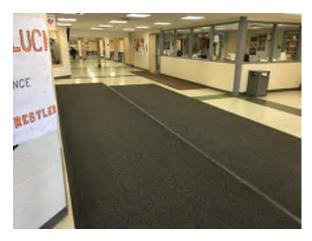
High School main entrance. Long walk-off mats are in place at the entry over vinyl flooring.
